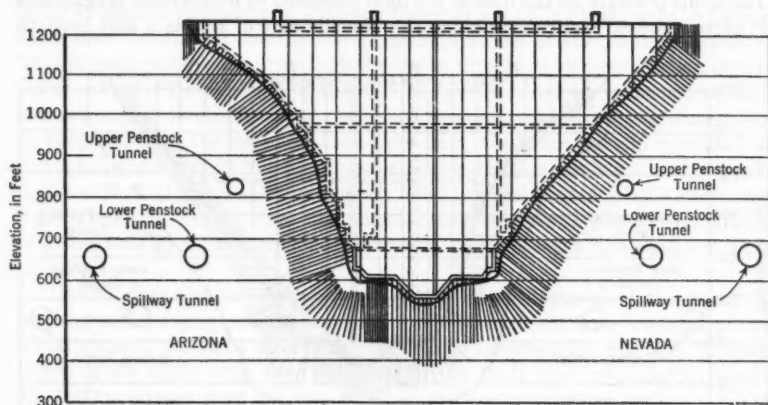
PROFILE OF DAM SITE SHOWING PATTERN OF ORIGINAL GROUT CURTAIN
